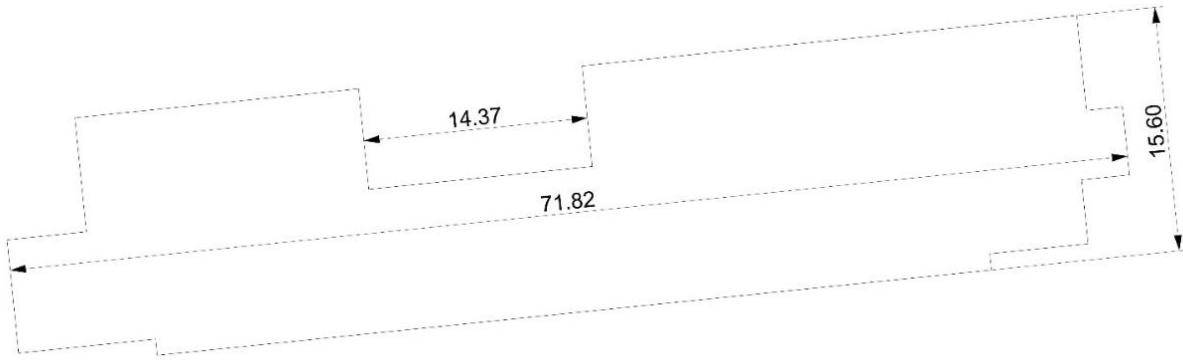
Jaber Ahmad Al Sabah Public School, Ras Beirut- Rooftop Plan (Prepared by: author)
